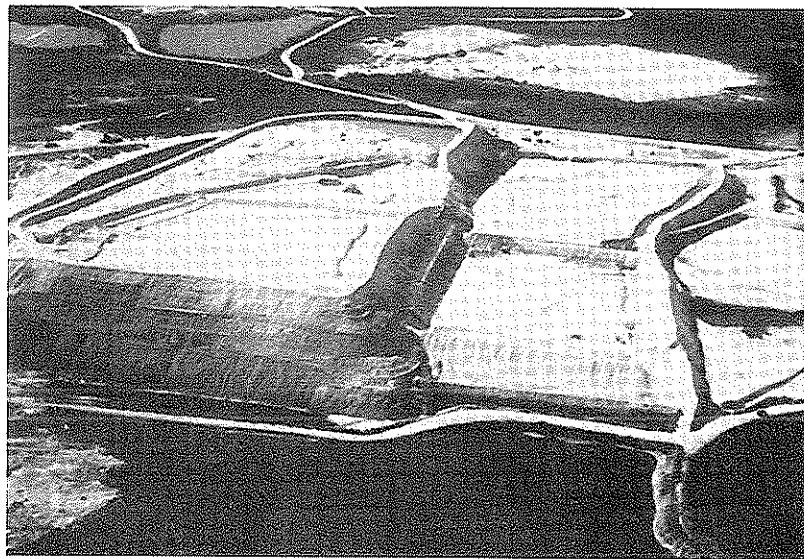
Phosphate Fertilizer Plant Gypsum Stack Near Bartow, Florida.
